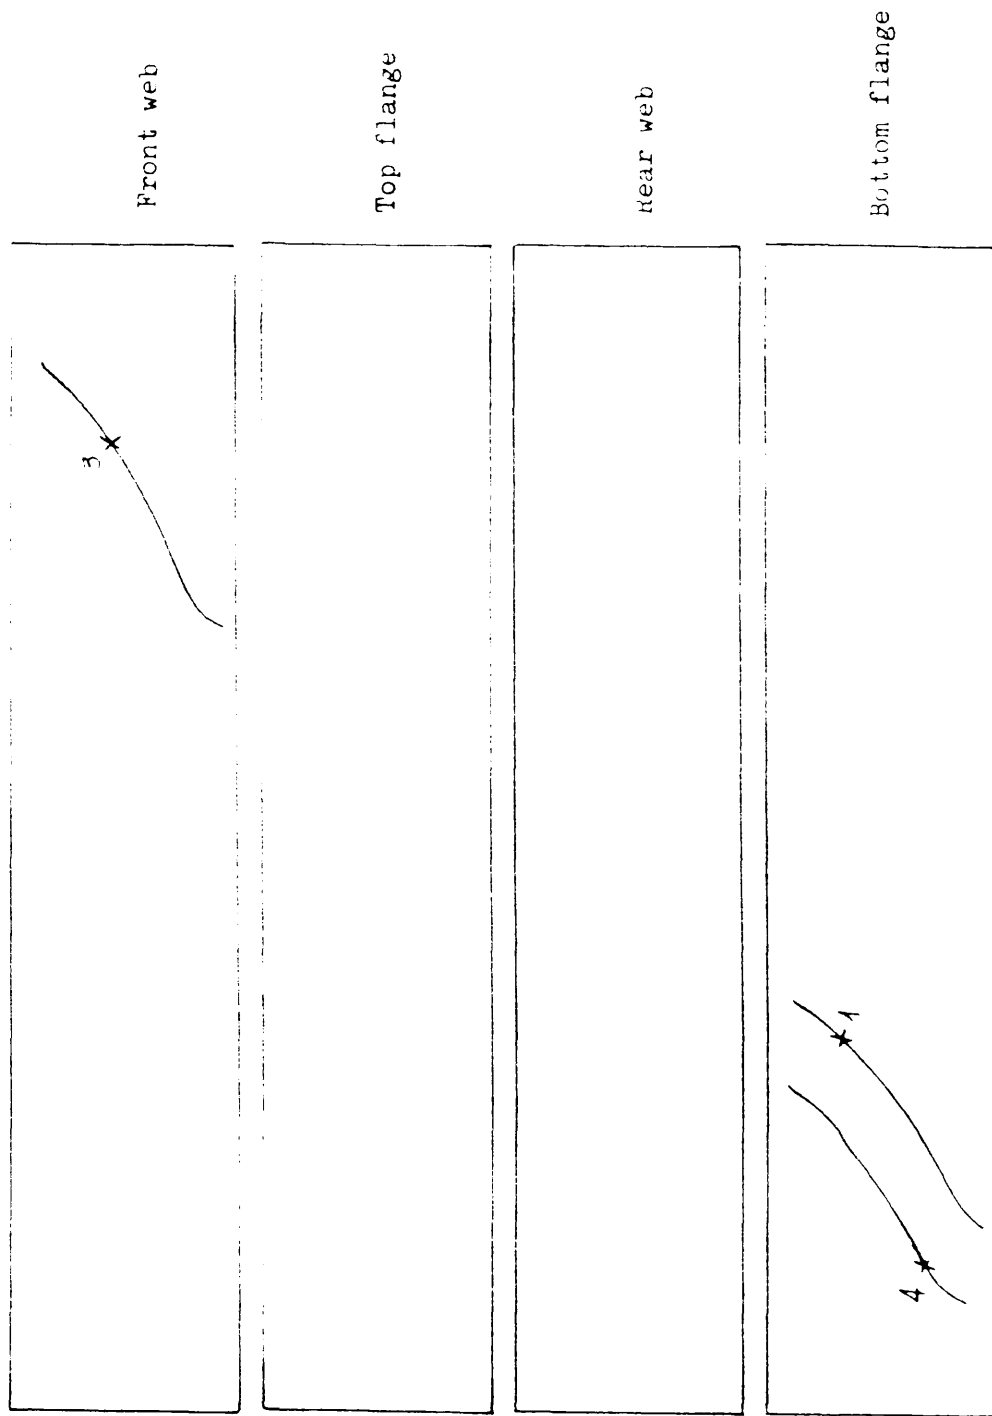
Location of cracks where the beam was subjected to a load for beam A3
